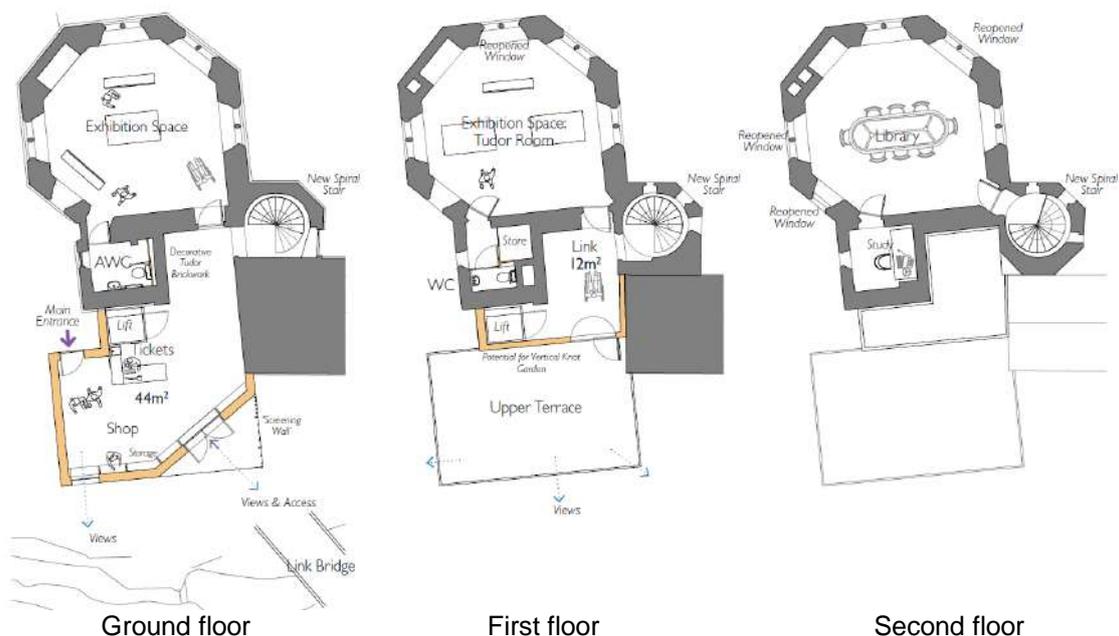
Proposals for the North-West Tower (Purcell Architects)
